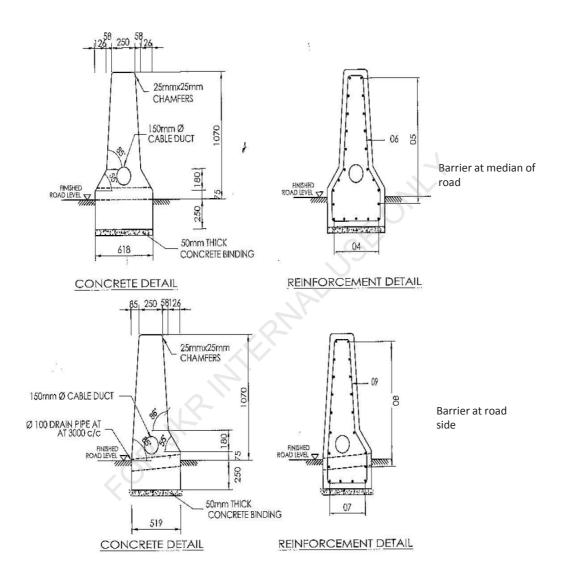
Typical Cross Sections for Reinforced Concrete Barrier (1070mm)
